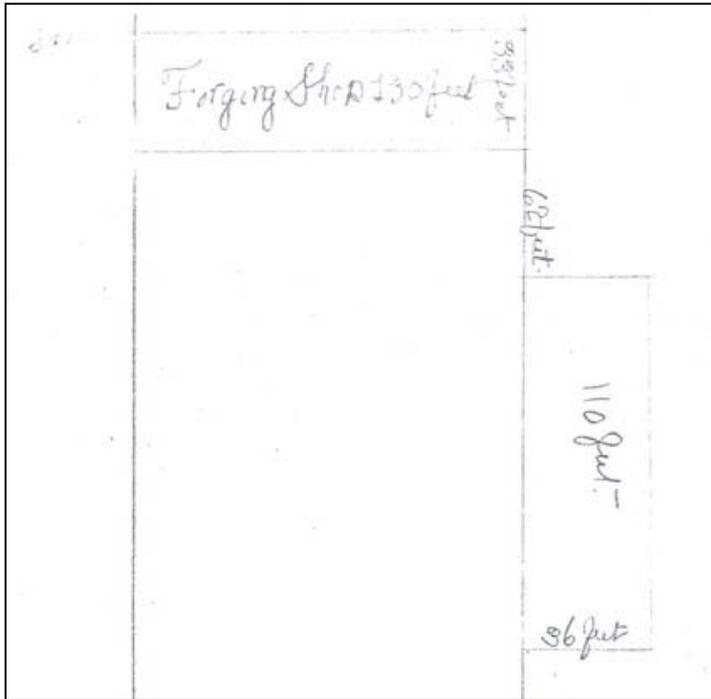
Detail from "Plan C" for construction of the North and South Shops, March 23, 1824. Plan shows existing Forging Shop, 130 feet by 33 feet, and the new North Shop.
